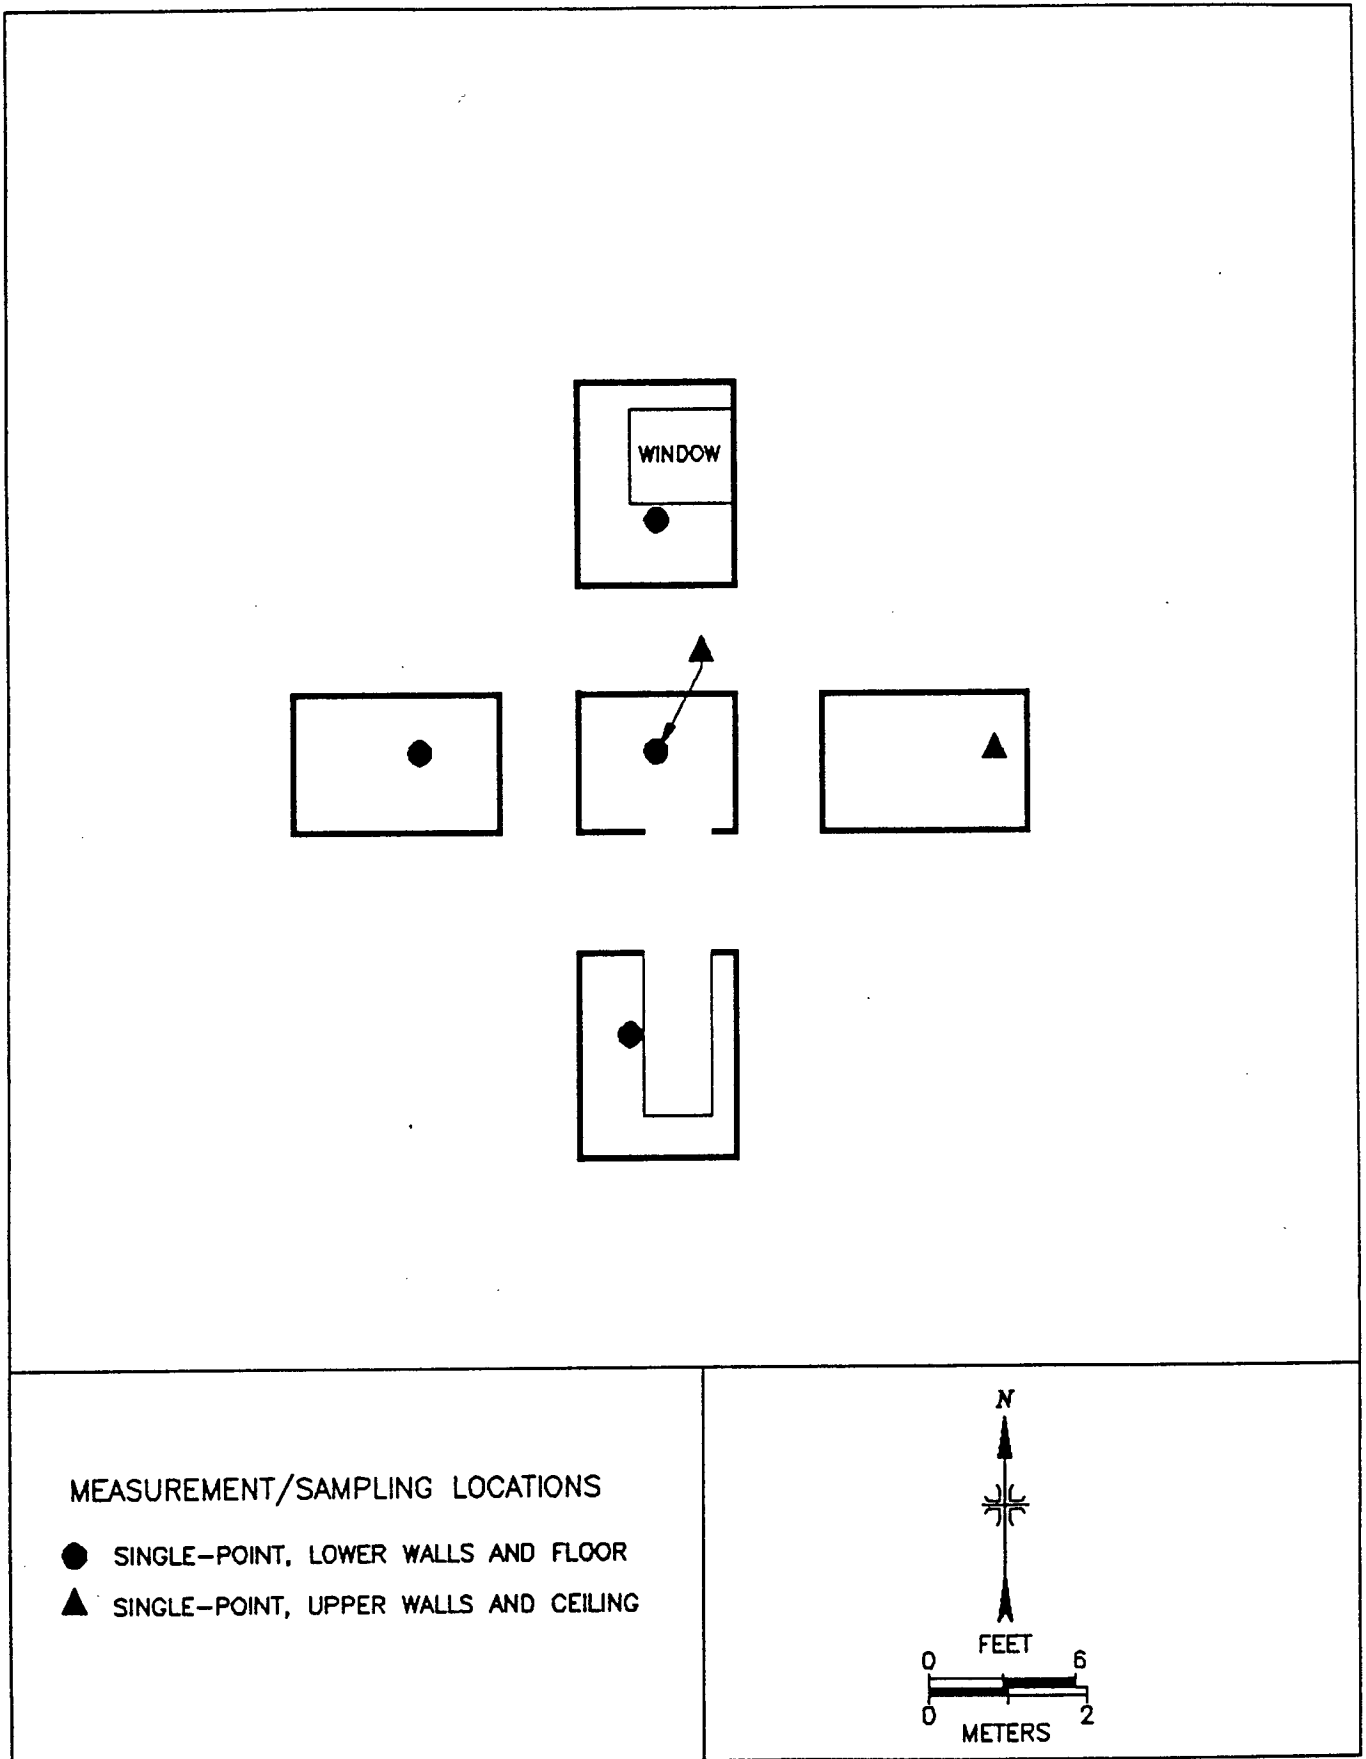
Building 429, Room 6 – Measurement and Sampling Locations
